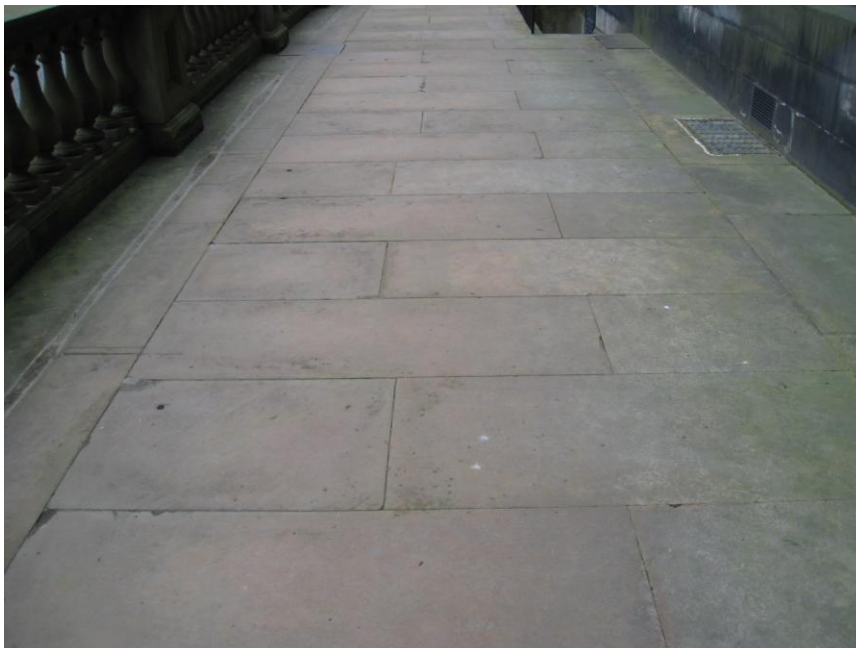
Typical 'wide' section of paving on terrace area (southeast side), showing regular sized slabs, with two single rows at edges with slabs aligned parallel to direction of footpath (note edge adjacent to balustrade has dished gutter). The central area consists of regular sized slabs (one large, one small) laid in courses perpendicular to the pavement direction. (3069).
